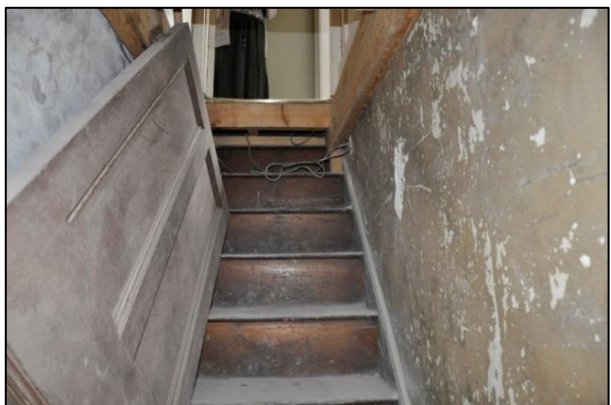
Historical, probably original, stairs linking servants' rooms with north west room (1.01)
